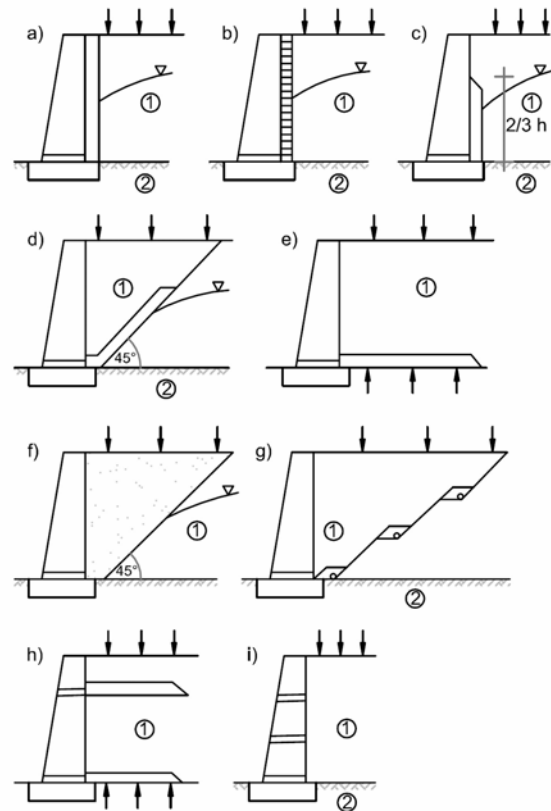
Possible alternatives of locating the drainage layer at the gravity wall rear (1 cohesive retained soil – solid or backfilled, 2 impermeable foundation soil)
